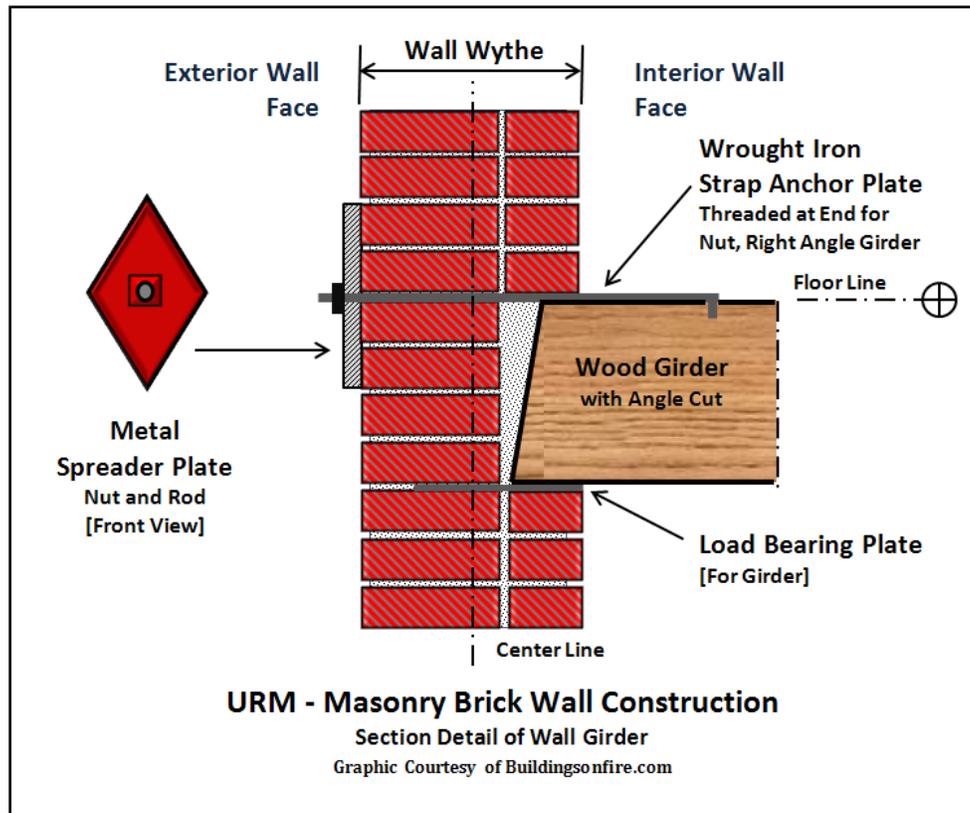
URM- Masonry Brick Wall Construction and Girder Detail
